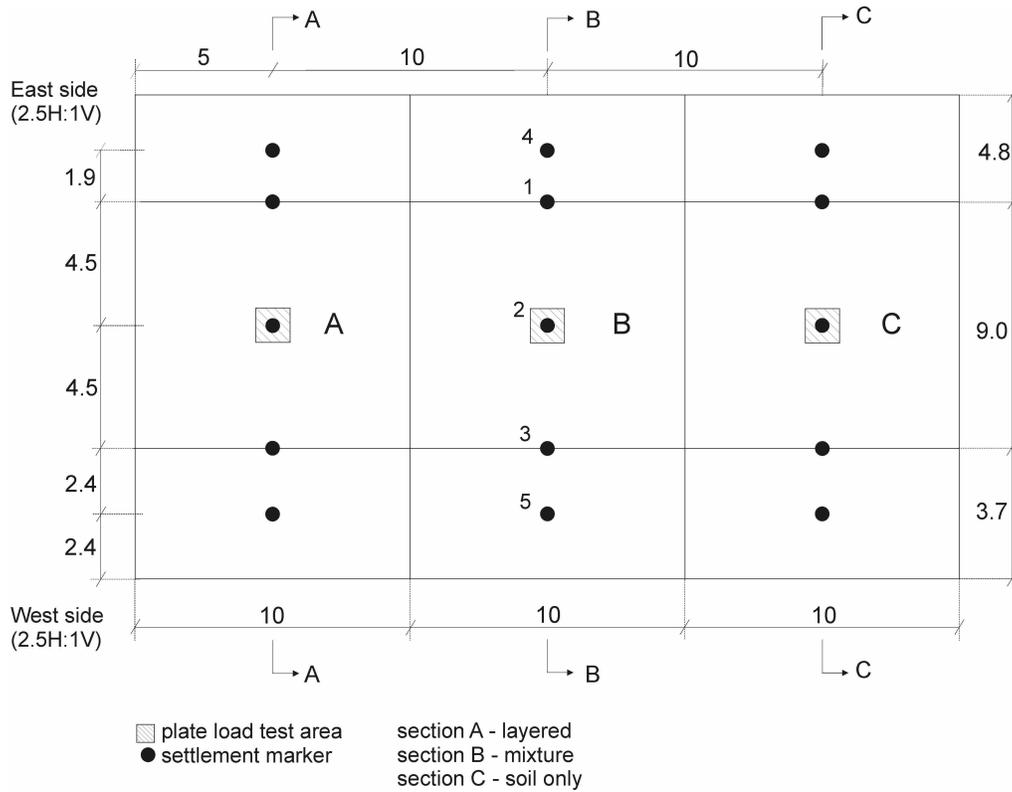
Plan View of the Prototype Embankment. Dimensions in meters.
